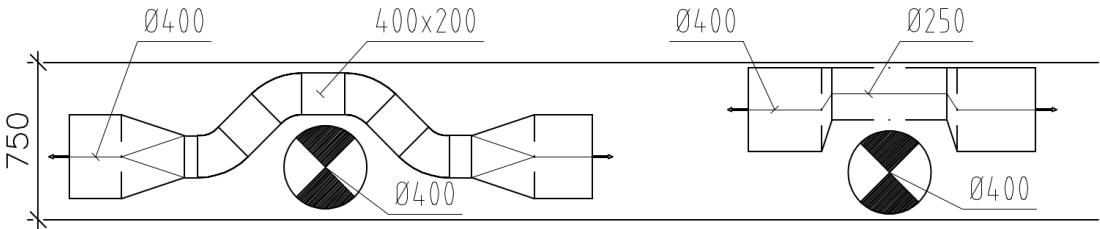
Changing rectangular crossing into round duct for a cheaper and faster installation.
